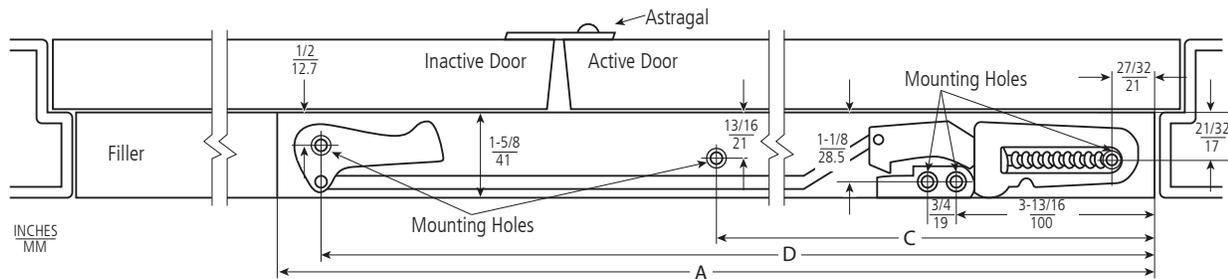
ACTIVE AND INACTIVE DOOR STRIKE PLATES
